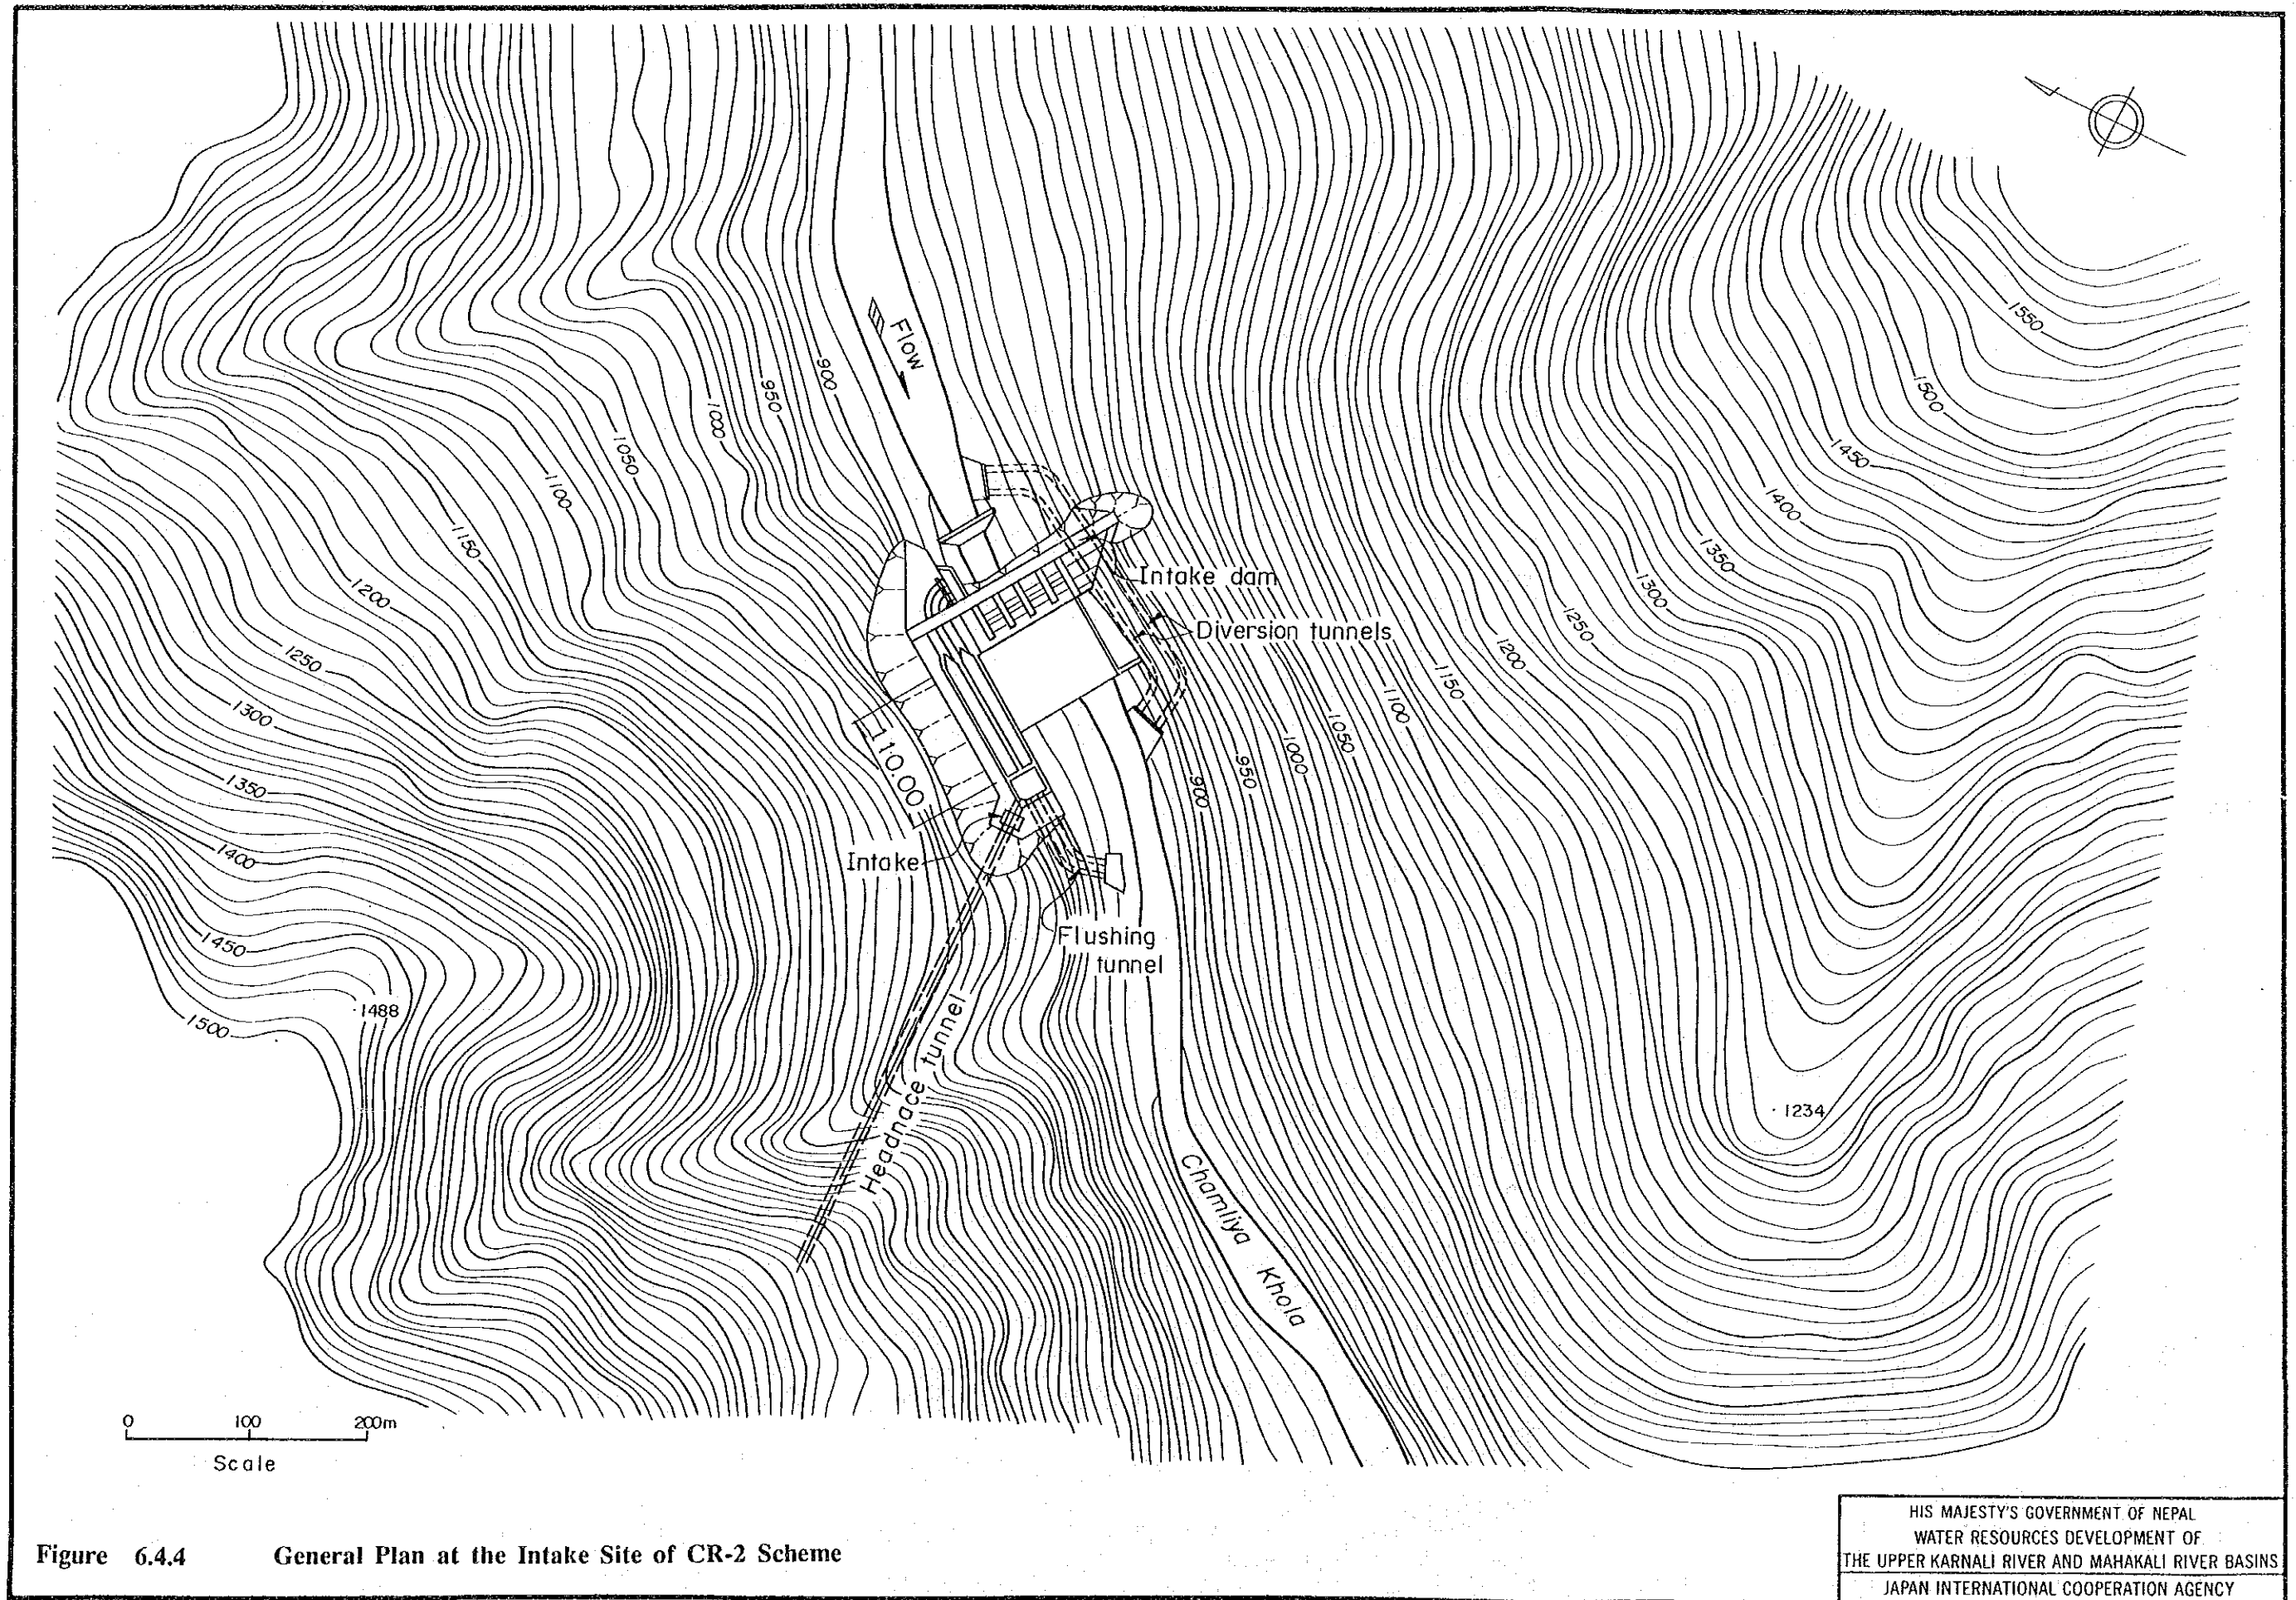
General Plan at the Intake Site of CR-2 Scheme
